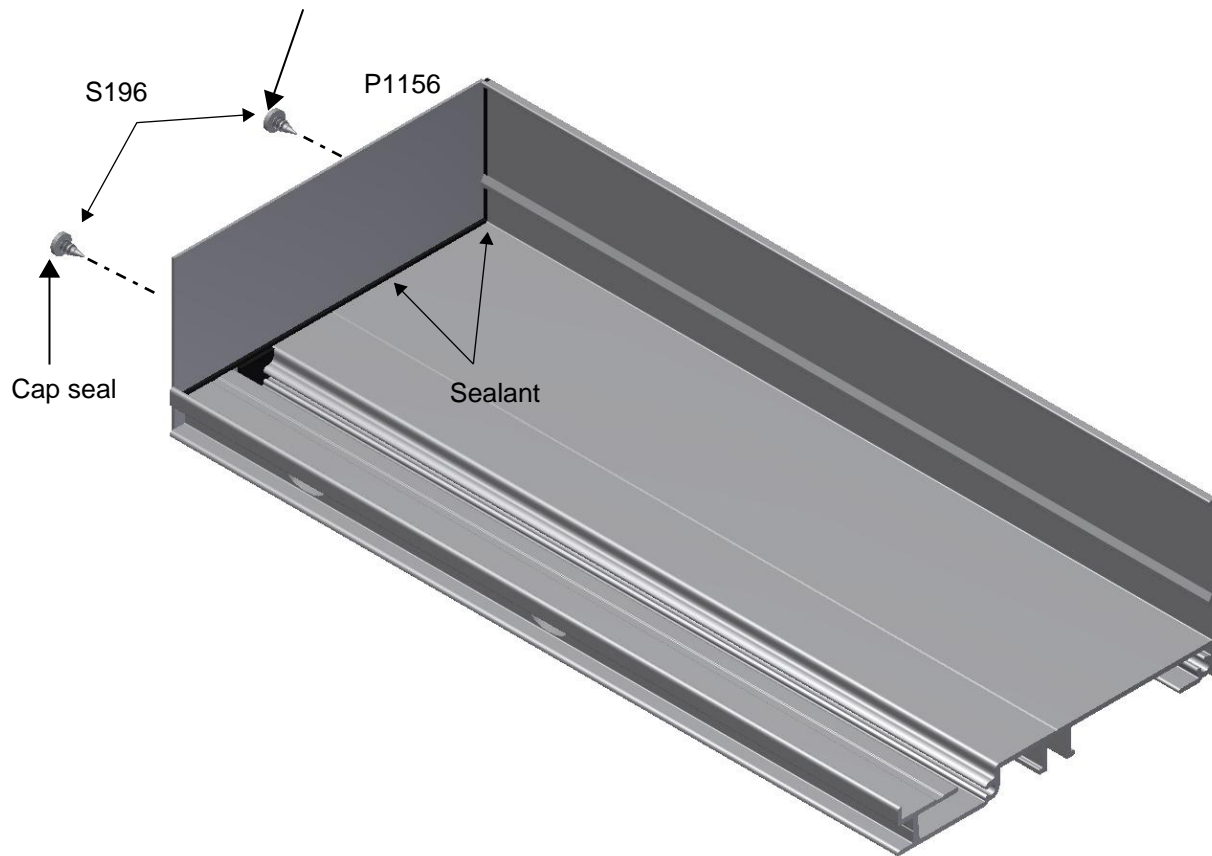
Attach an end dam to the end of the sill flashing at a wall.
